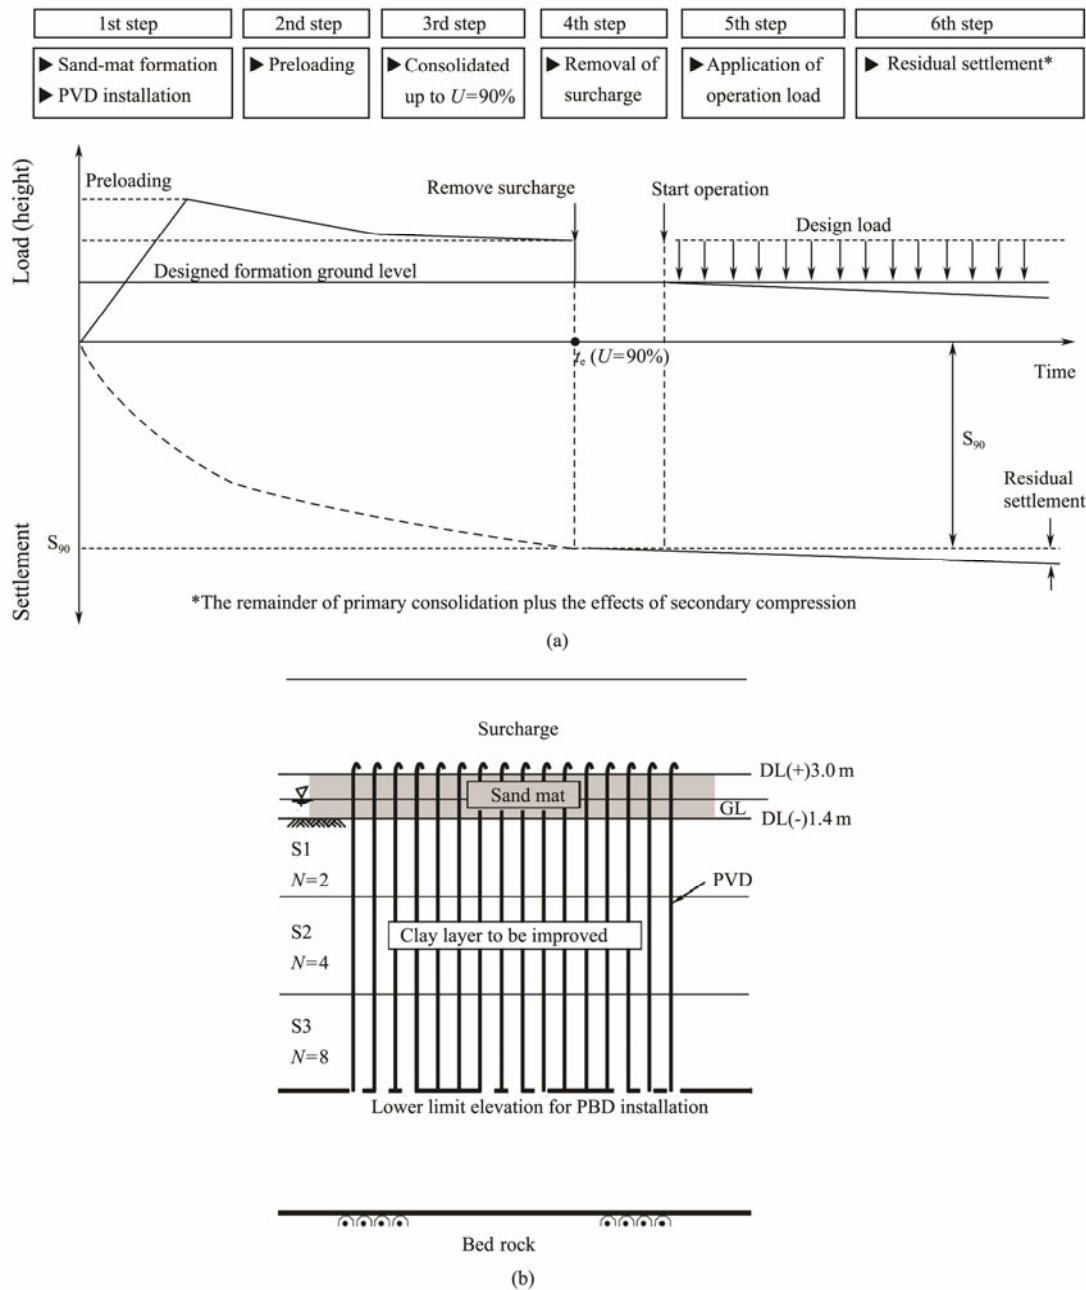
(a) Soft ground improvement process with PVD and preloading, and (b) Schematic profile of PVD installation.
